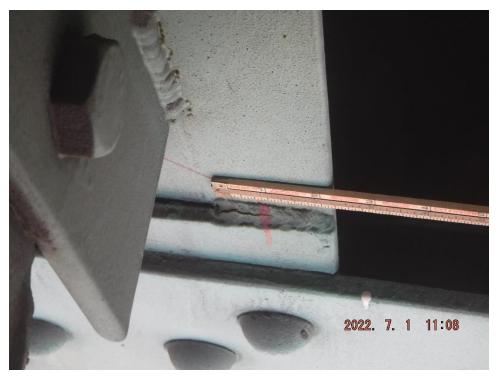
Cracked tack weld on fill plate (Center Truss, Span 8, L25-U25 shown)
